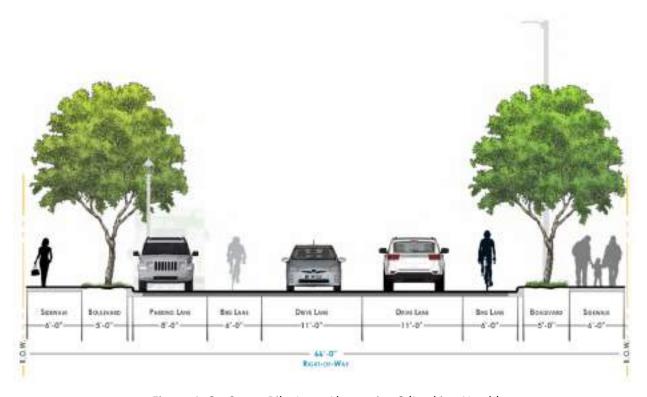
On-Street Bike Lane Alternative C (Looking North)
